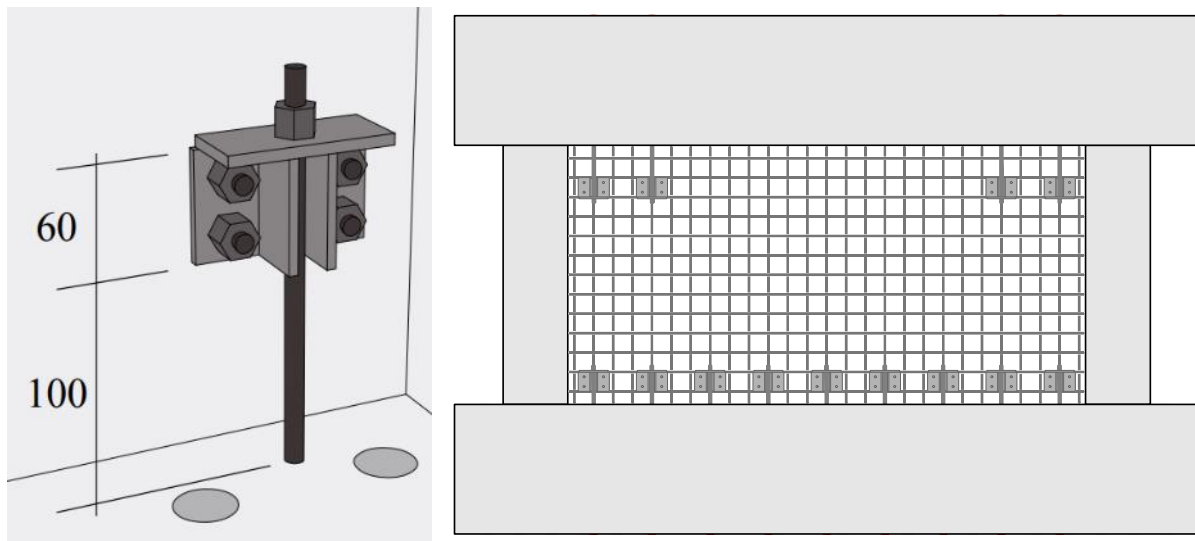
Retrofit used for Wall B: (left) photograph of retrofit, and (right) elevation view with panel concrete hidden.
